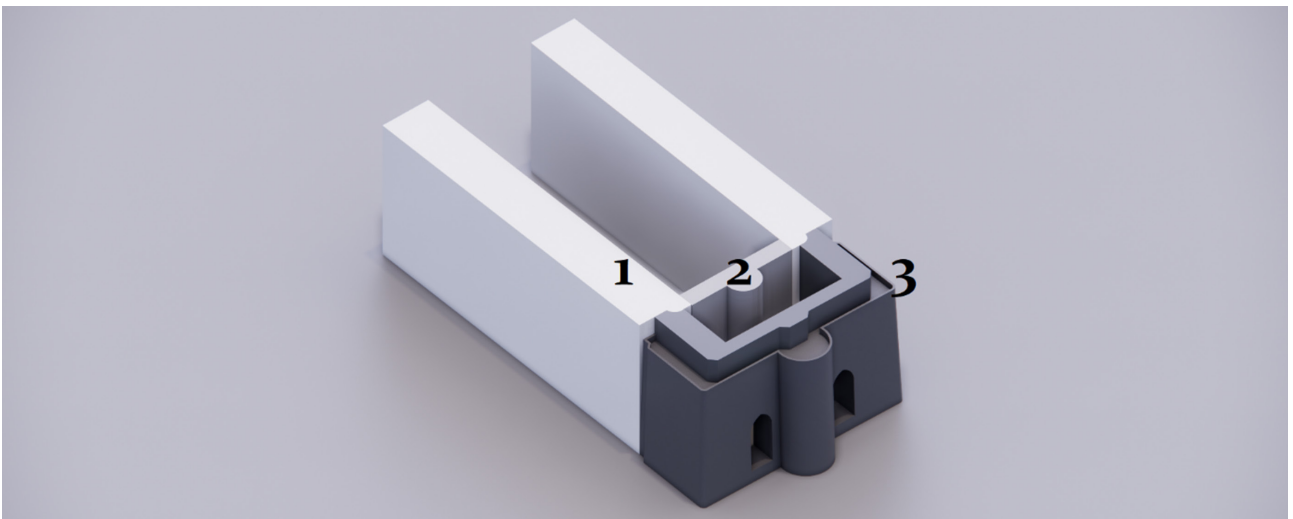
A Revit 3D modeling of the Arch of Tabriz showing the position of the retaining wall or the Mihrab wall of the earlier northern building next to the later southern building: 1. The 80 m wall of Alishah's nave, which was unearthed by the 2016 archaeological excavation, 2. The retaining/ Mihrab wall, 3. Tavūs Khāneh or Alishah's mausoleum. Source: Safiri, 2025.
